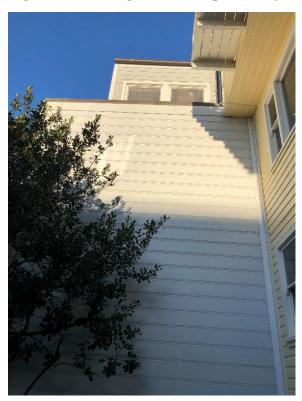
Existing 15-foot deep wall adjacent and to the east of my home – View 2
